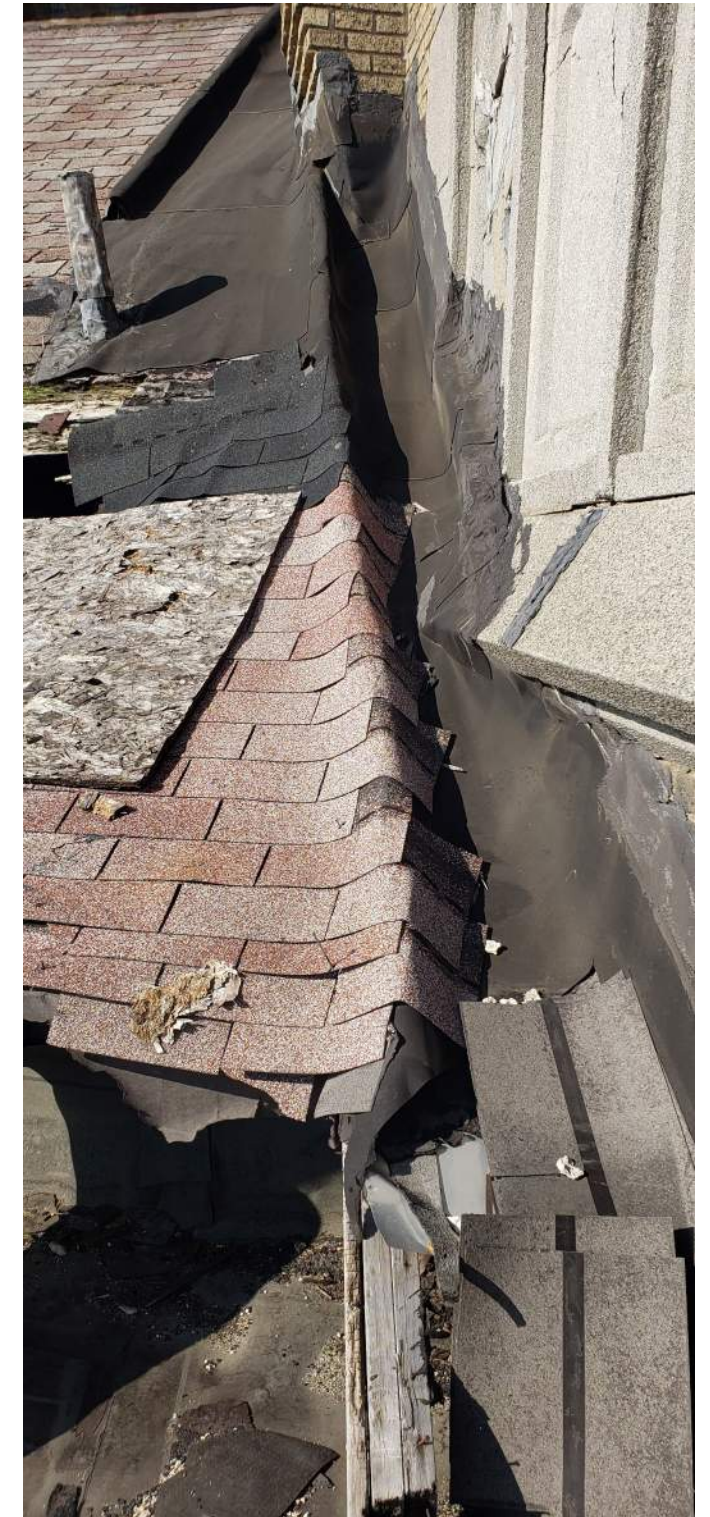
IMPROPER FLASHING AND PATCHING AT THE VALLEY JUNCTION BETWEEN THE POLYGONAL ROOF AND BELL TOWER; THE ASPHALT SHINGLES ARE NOT PROPERLY TERMINATED; EXCESSIVE USE OF ROOFING MASTIC ALONG THE BELL TOWER WALL; DETERIORATED ROOF VENT NEAR THE LARGE HOLE IN THE ROOF.
